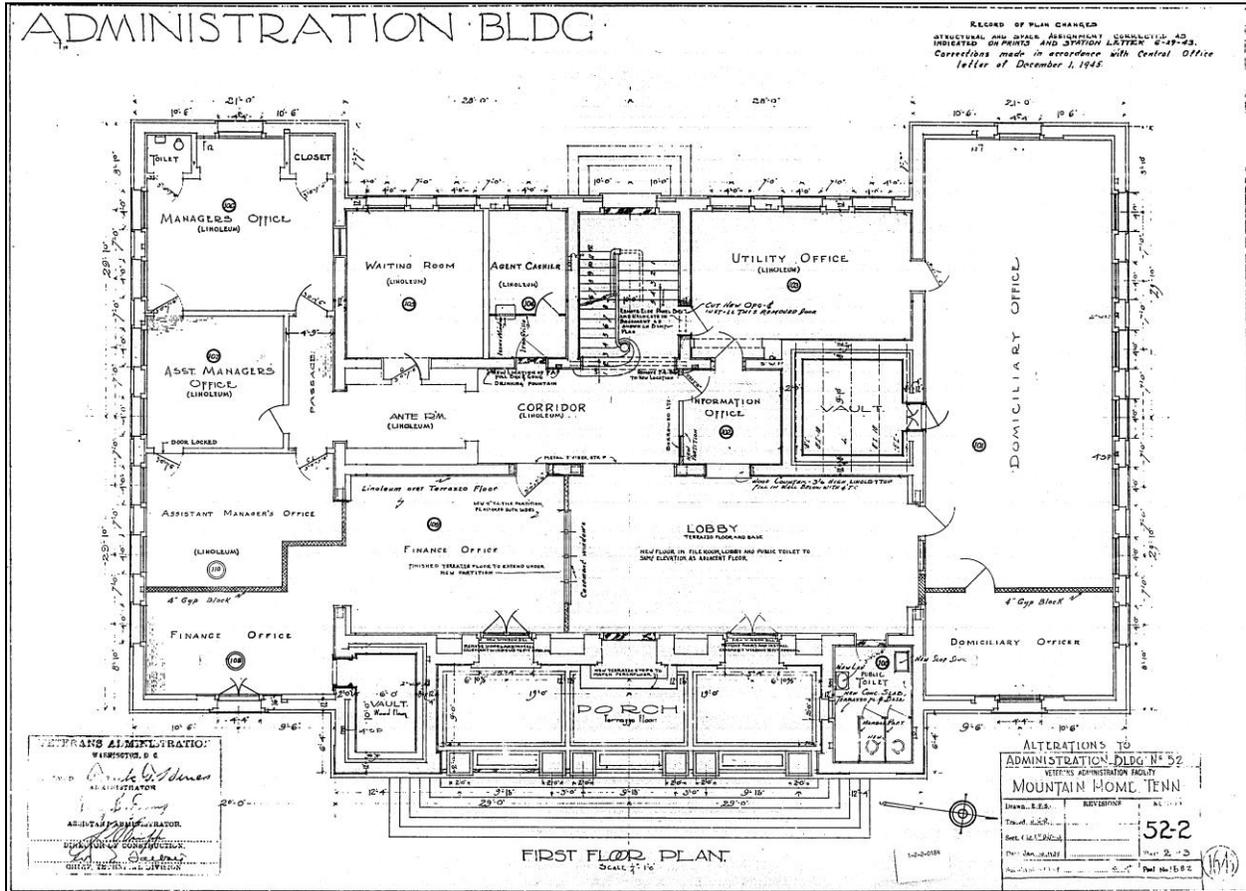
Mountain Branch Administration Building, First Floor Plan, (10 June 1939).
